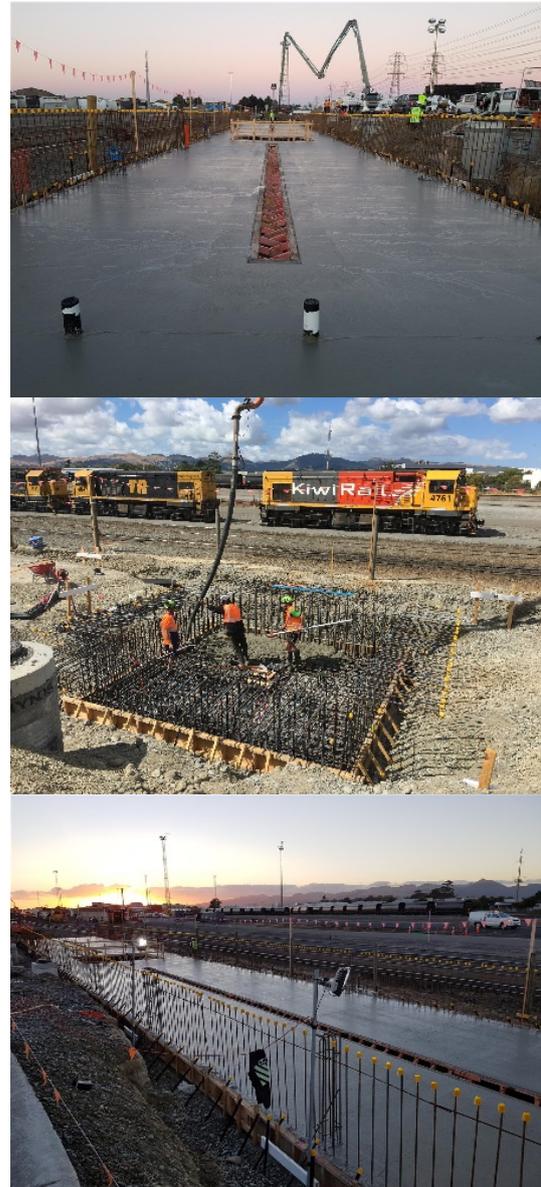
SFRC and conventional reinforcement for Kiwi Rail Locomotive Wash Raft Slab
